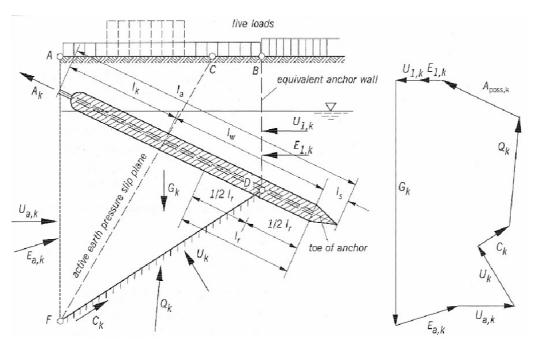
Failure mechanism for anchor pile (corresponds with a Kranz verification)
